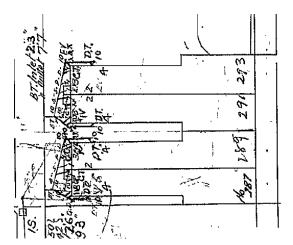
Plan showing footprints of the buildings at 287-293 Brunswick Street in May 1911, annotated with sewerage works. North is up (Property Sewerage Plan No. 78136, 9 May 1911)
